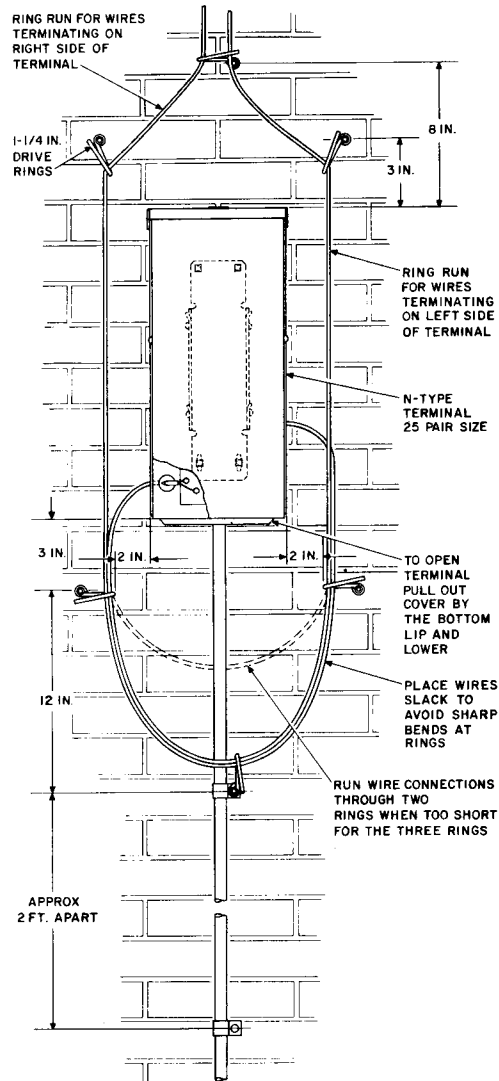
Wall Mounted 25-Pair Cable Terminal With Stub at Bottom
